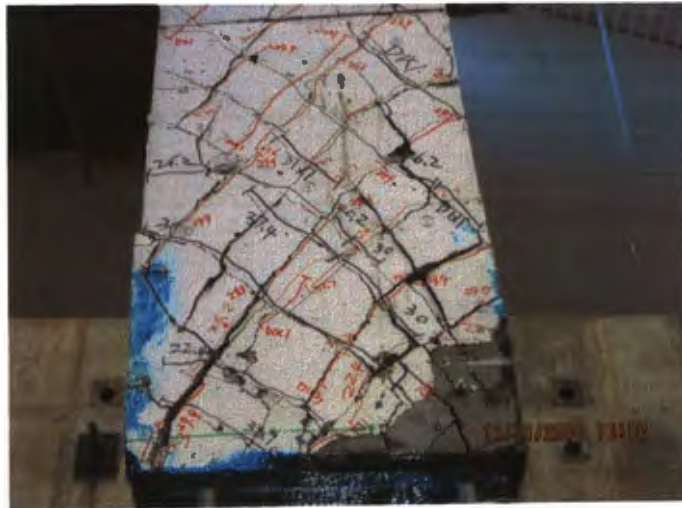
Concrete Cracking Above CFRP on West Face of Column #3
